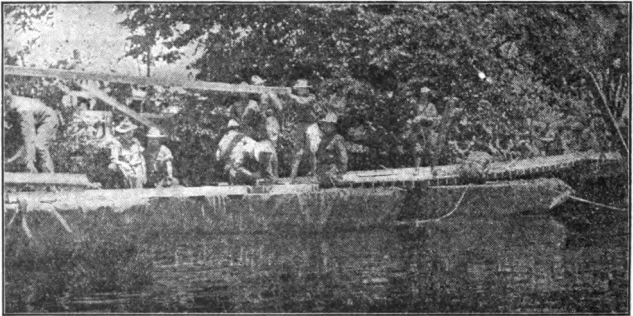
CONSTRUCTION OF BRIDGE, LIGHT TRAIN
